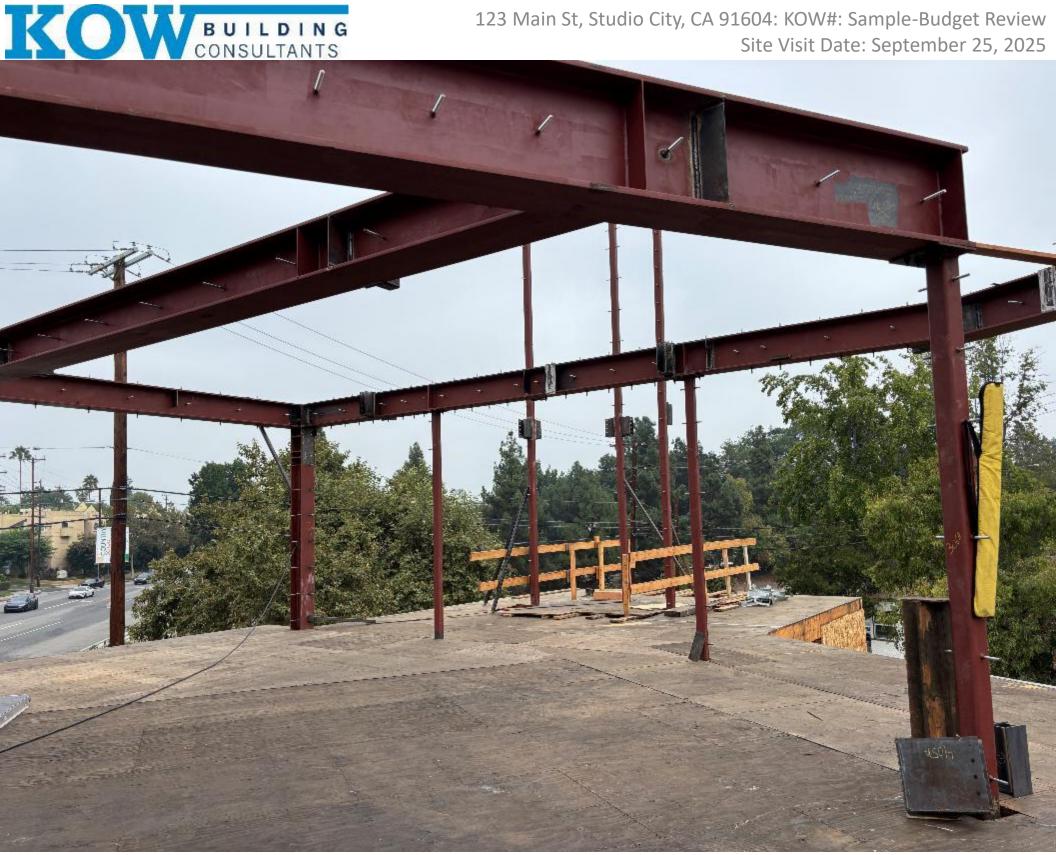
Elevator area at the second floor. (Elevator will extend to the third-floor/roof deck)
